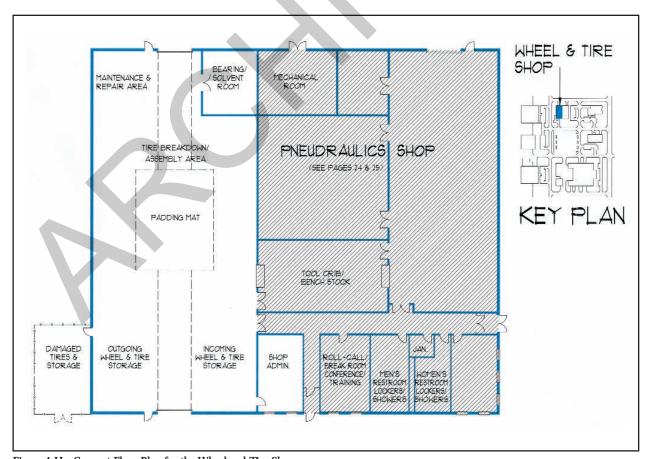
H: Concept Floor Plan for the Wheel and Tire Shop.
